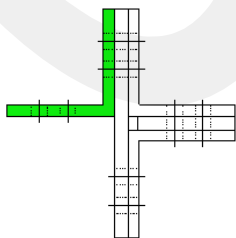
Bending on lower main member 1 (Specimen-6)
